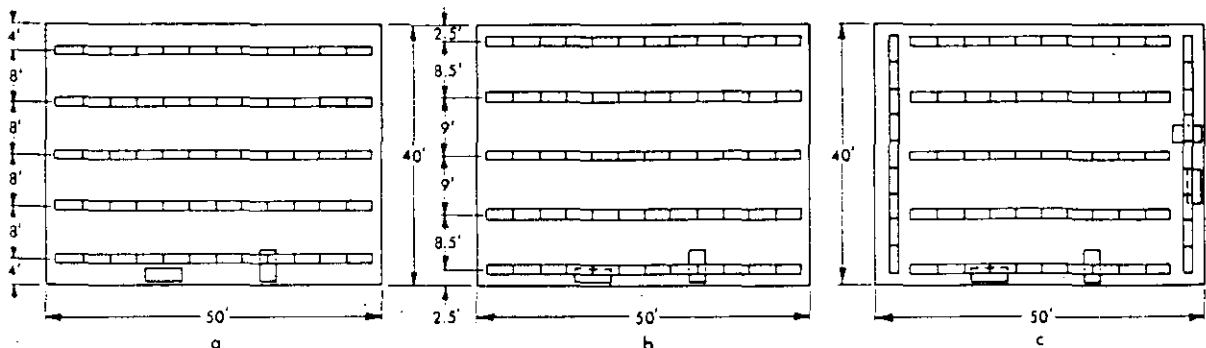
(a) Lighting layout using equal spacing between continuous rows of luminaires. (b) Layout is changed to provide higher illuminance near side walls. (c) By adding four more units on each end, layout (b) can be modified to provide 80 per cent more light near the end walls and prevent possible scallop effects. Dimensions are in feet.
